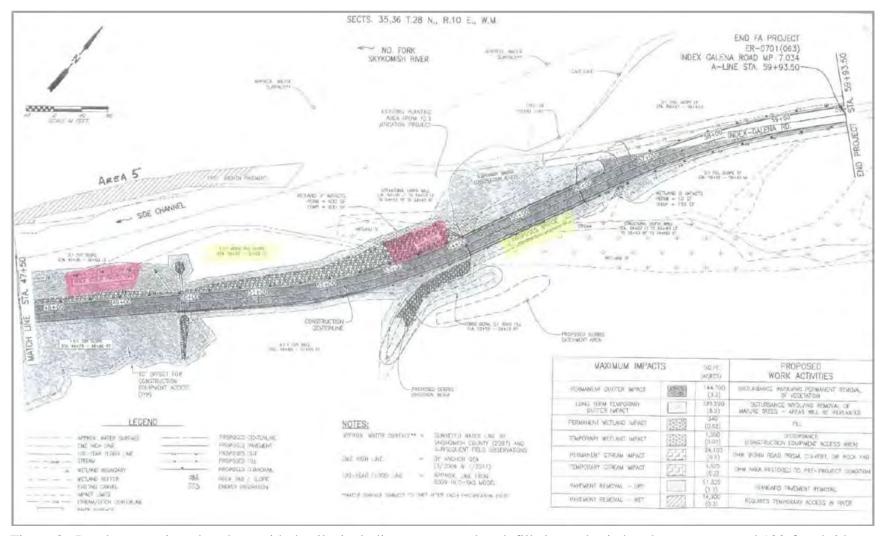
Roadway section plan sheet with details, including constructed rock fill slopes, buried rock revetment, and 180-foot bridge (Snohomish County Public Works 2015, Appendix D)
